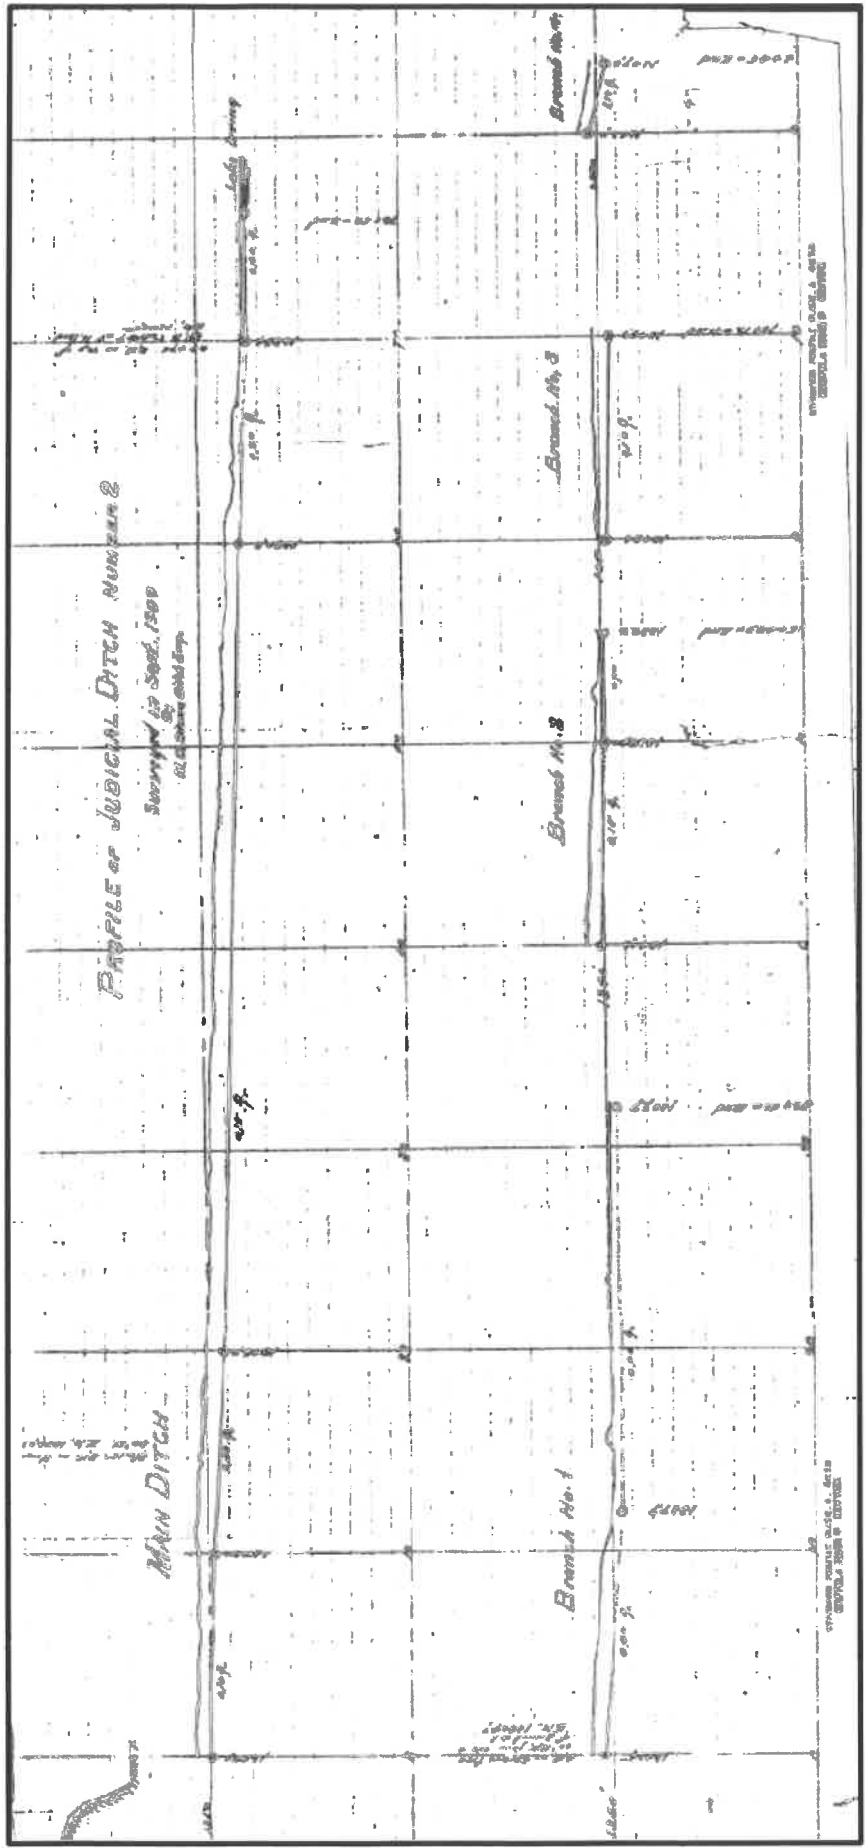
JD 2 LEGAL DITCH PROFILE (UNKNOWN DATUM)
